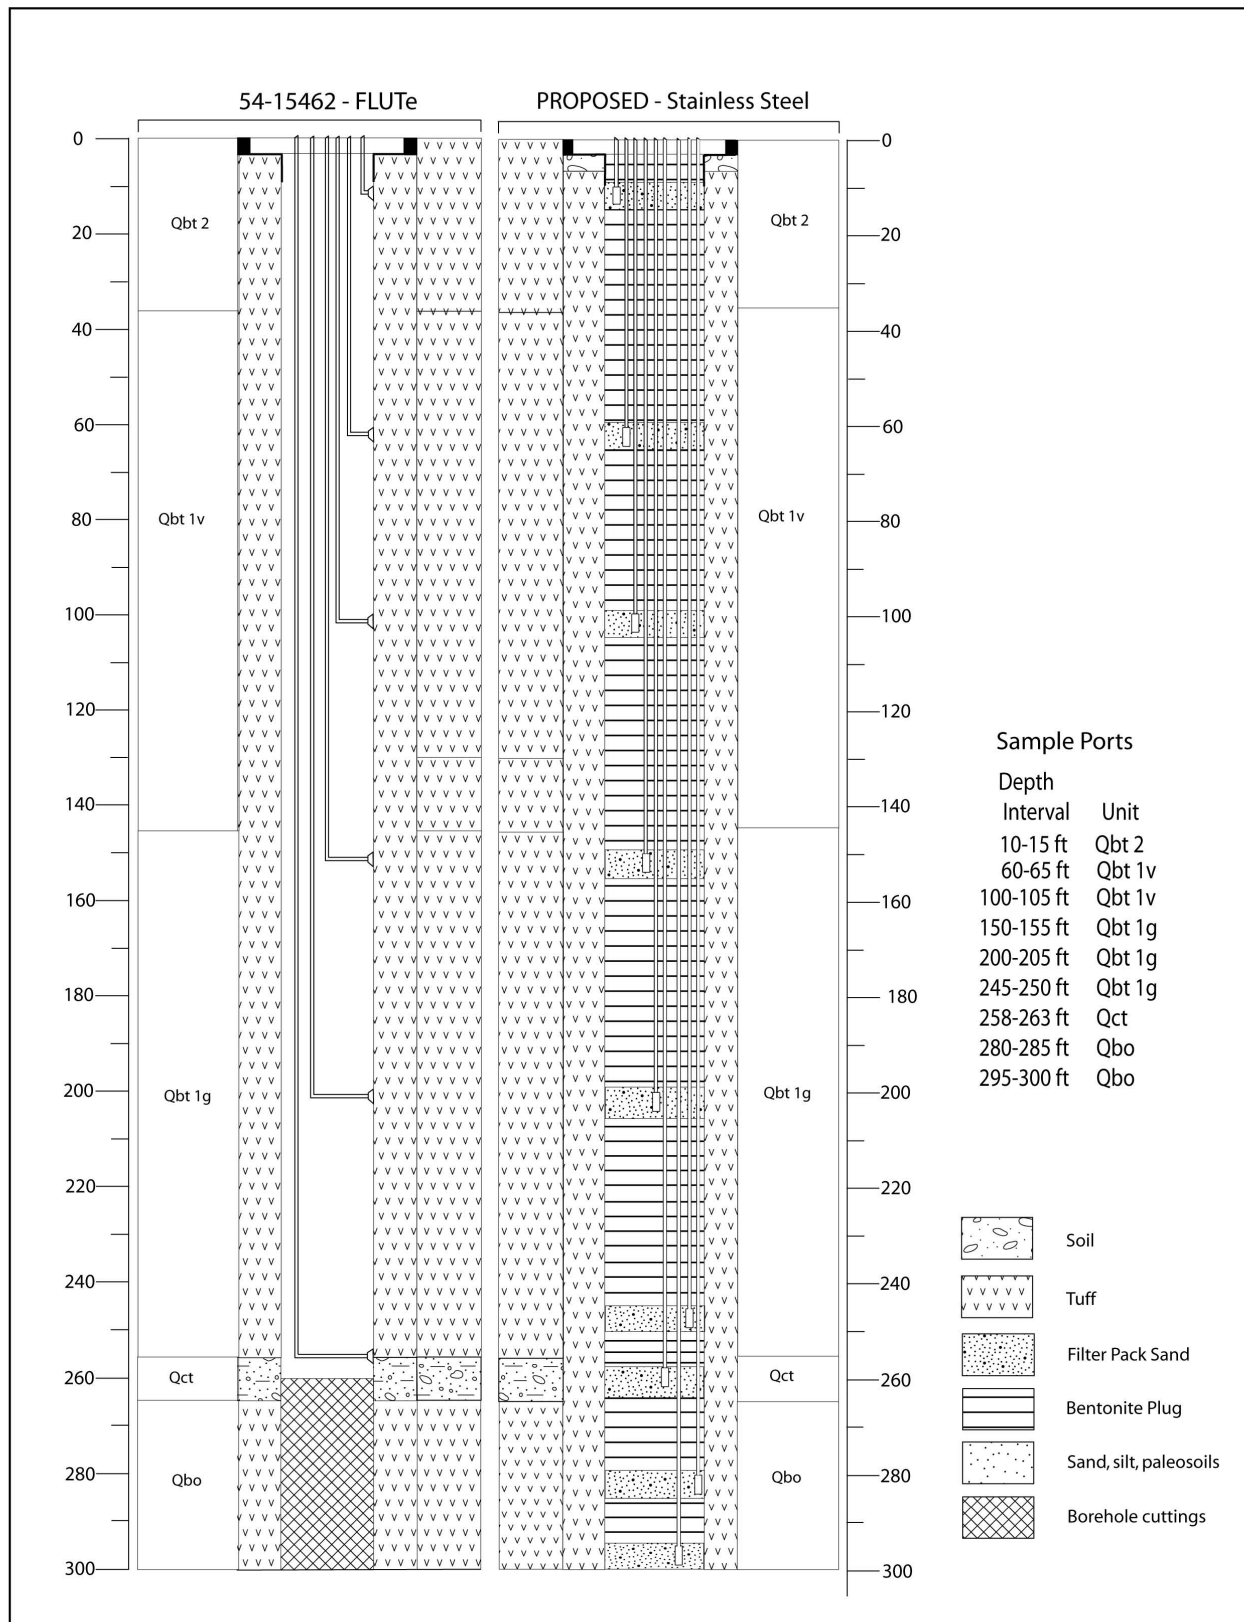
Proposed construction details of new vapor-monitoring well at MDA H
